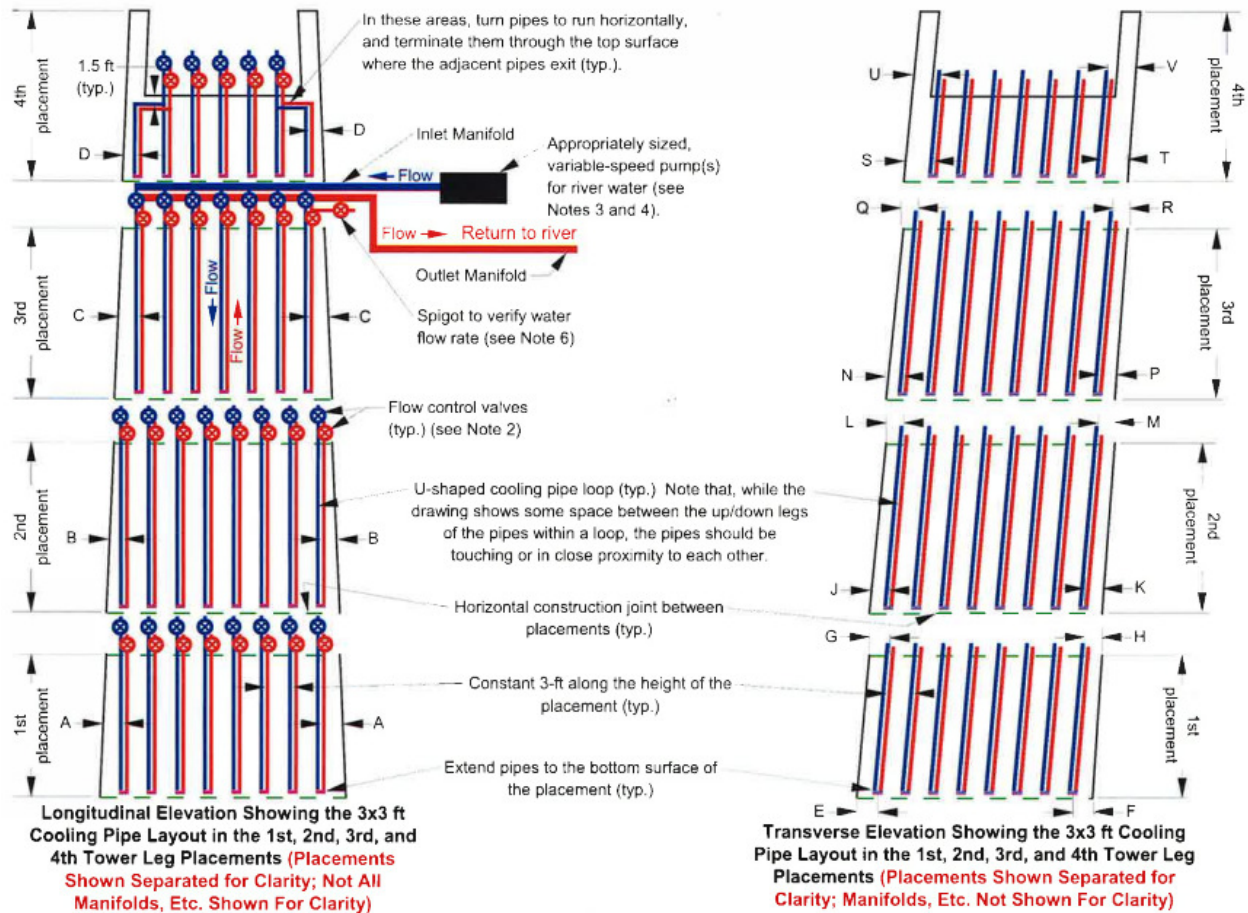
Longitudinal and transverse elevations of the Main Span tower leg cooling system(s) (Not to Scale).
